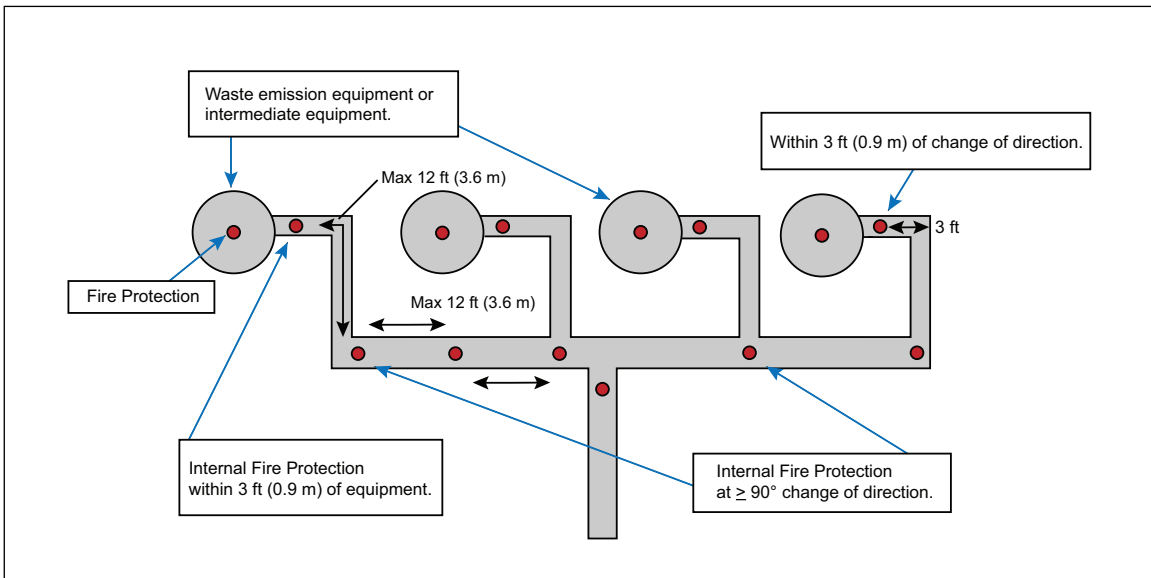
Sample sprinkler or water spray nozzle location layout for ductwork
